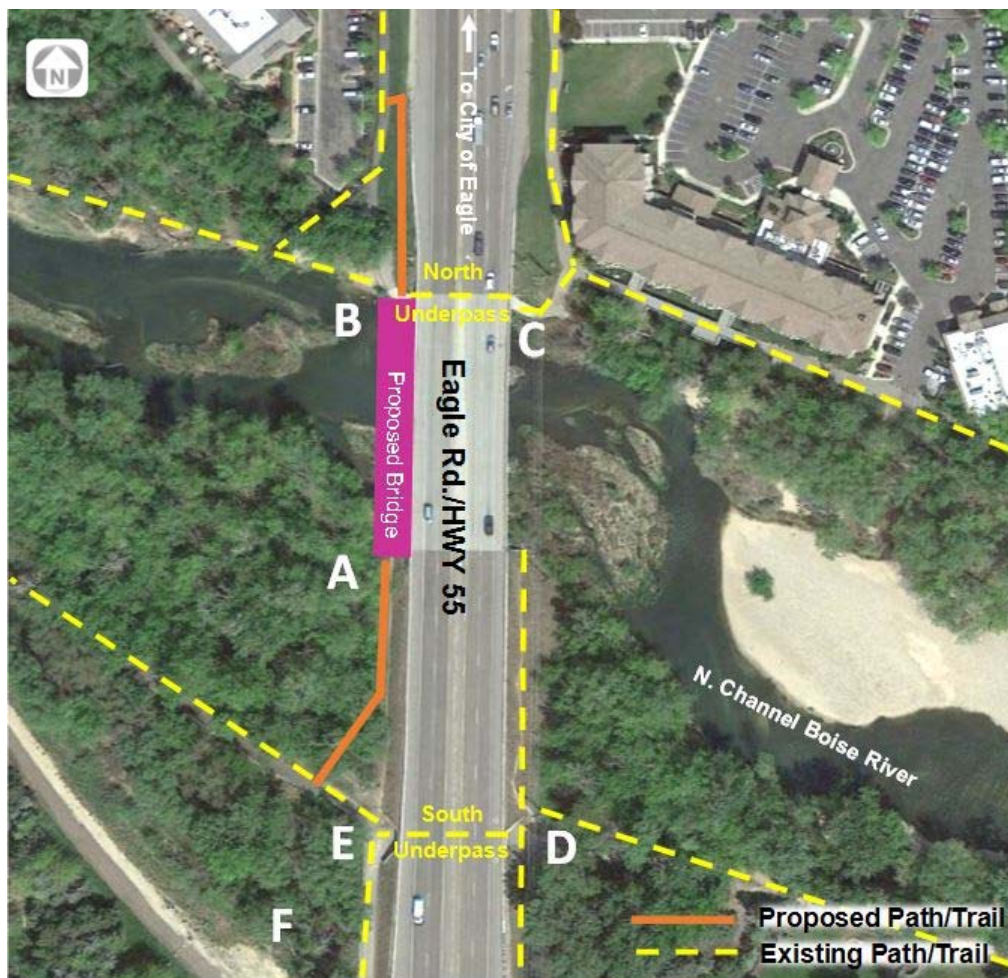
Bridge Plan View (existing path with reference Points A, B, C, D, E and F)
